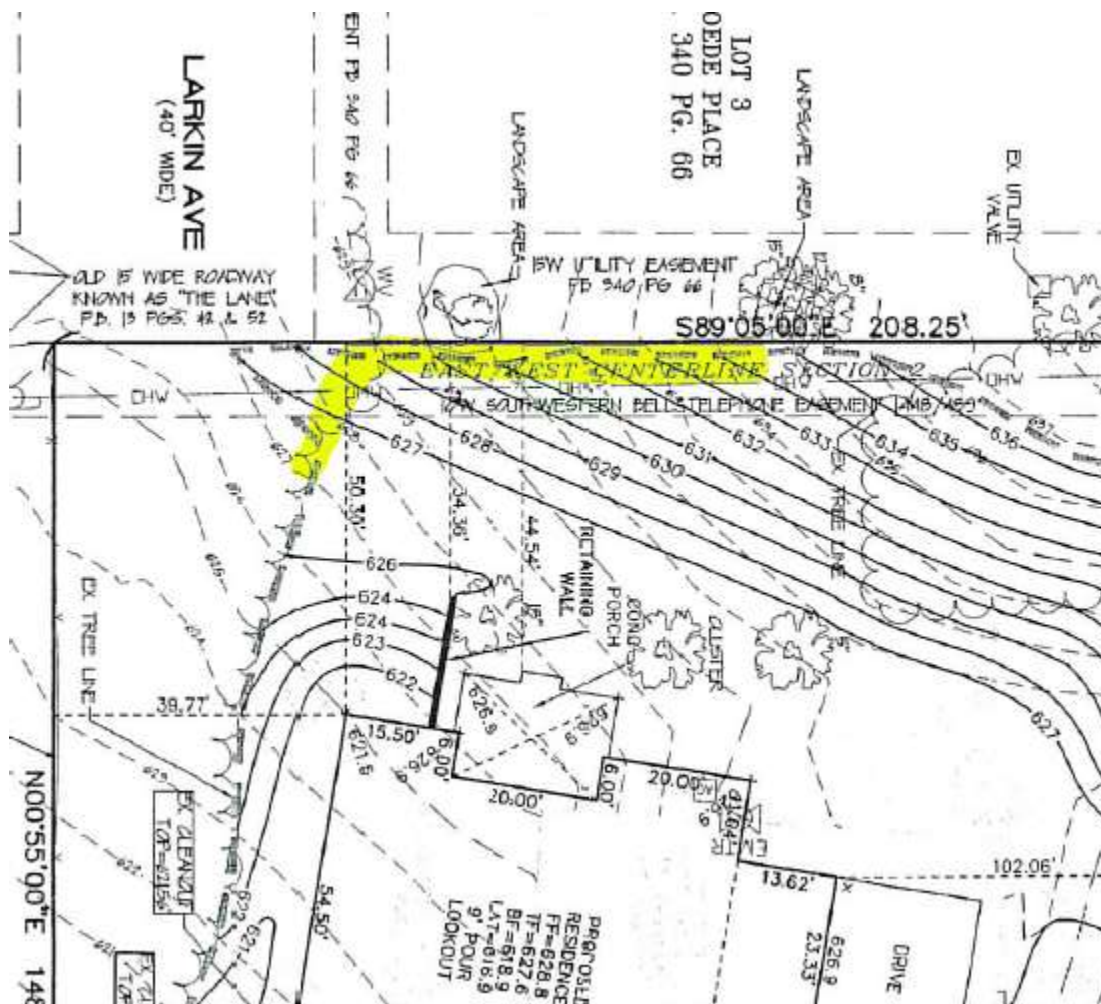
Close-up of the Applicant's Site Plan submitted August 16th.
